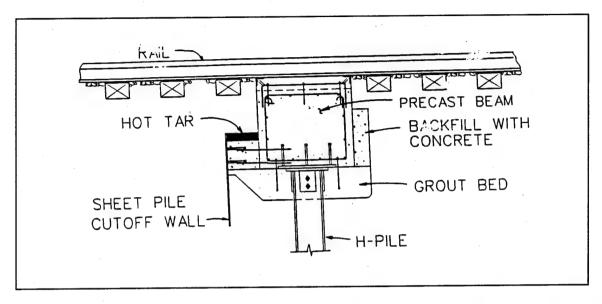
Cross section showing sill beam installation, Pineville Levee and Floodwall (from Gunnels 1991)
